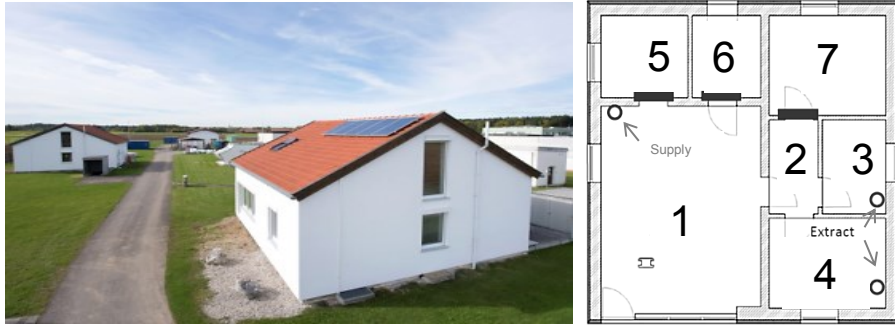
Image (left) and floor plan (right) of the Twin Houses
